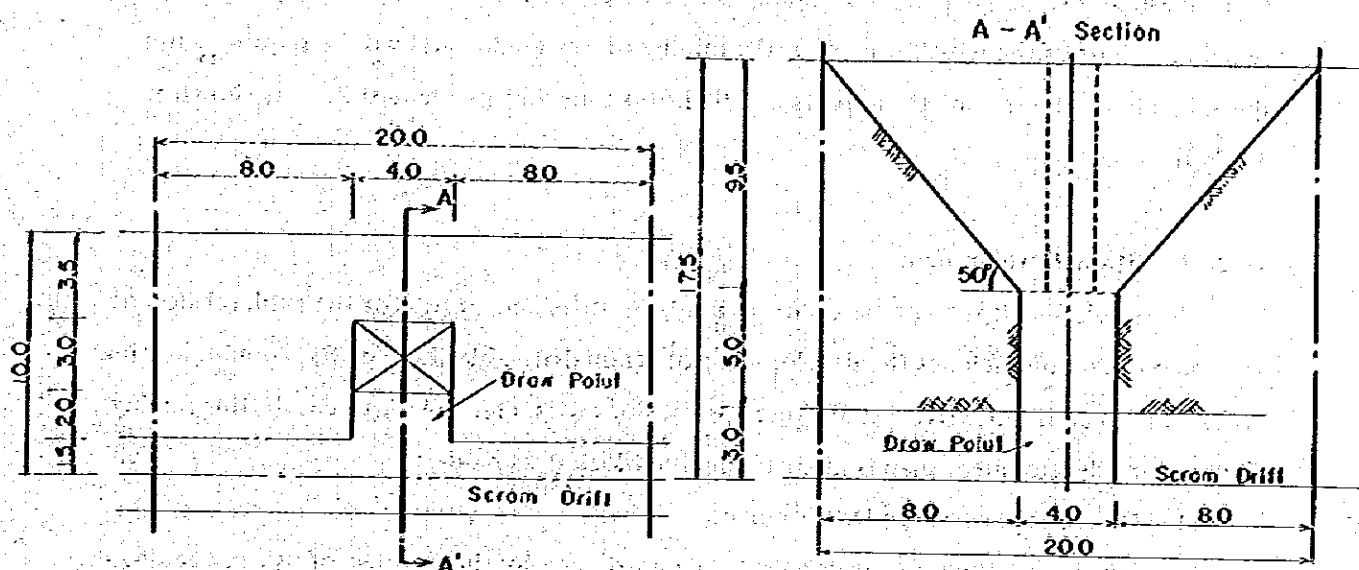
Plan and Section of Draw Cone (unit: m)
